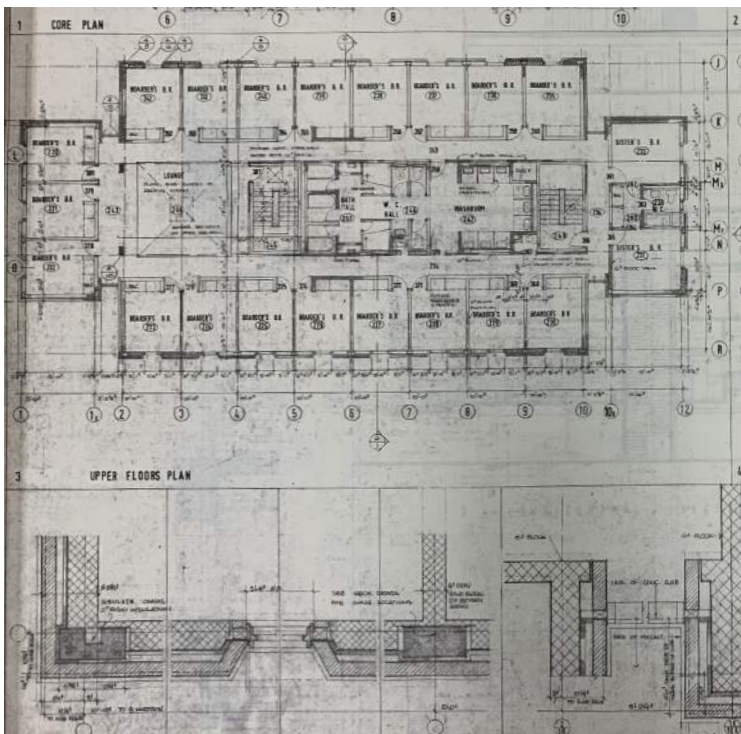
Floor plan and details, Building E (T. V. Murray, c. 1964).
